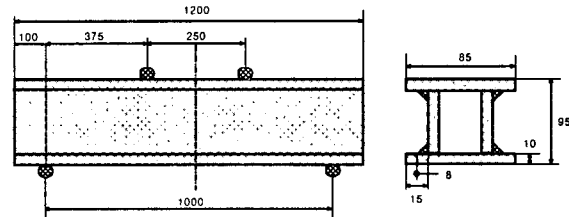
Dimensions and Shape of test specimen[unit:(mm)]
